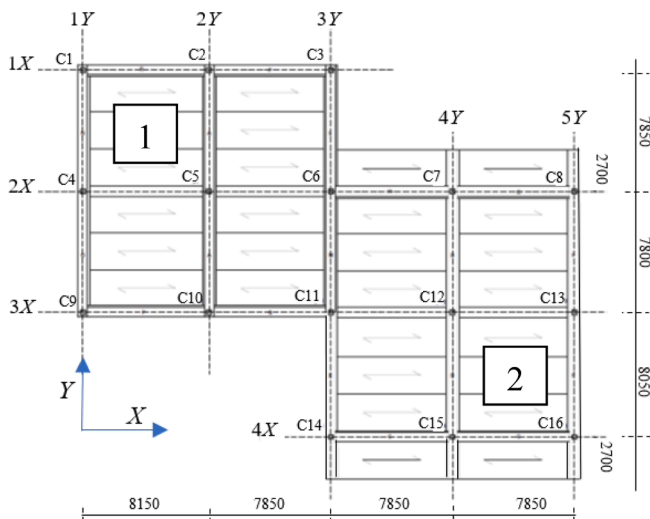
Structural plan of the case study building (dimensions in millimeters).
